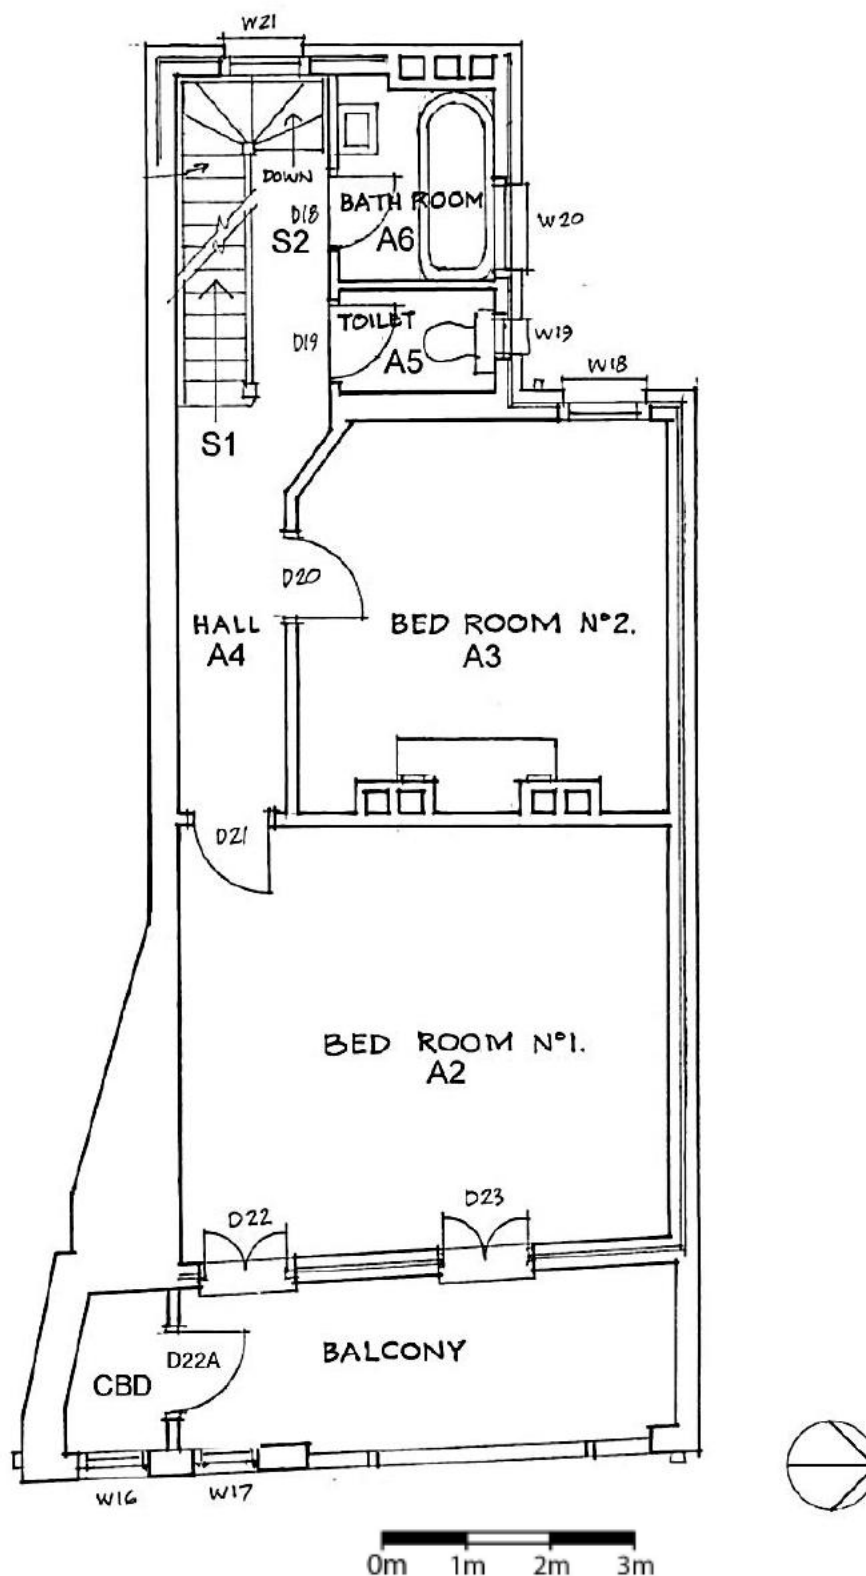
117-117A Gloucester Street – Second floor plan. Source: CLSP
